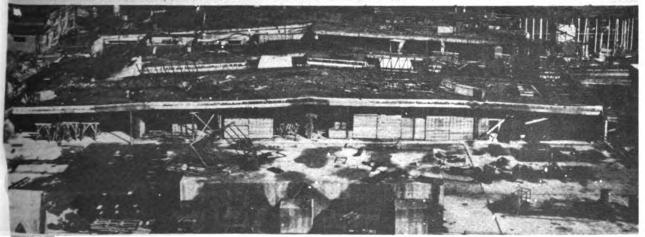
View looking north - Taken from roof of undamaged section of Bldg. R. Note disruptive pattern painting on shafts and material piled about to distract attention.
